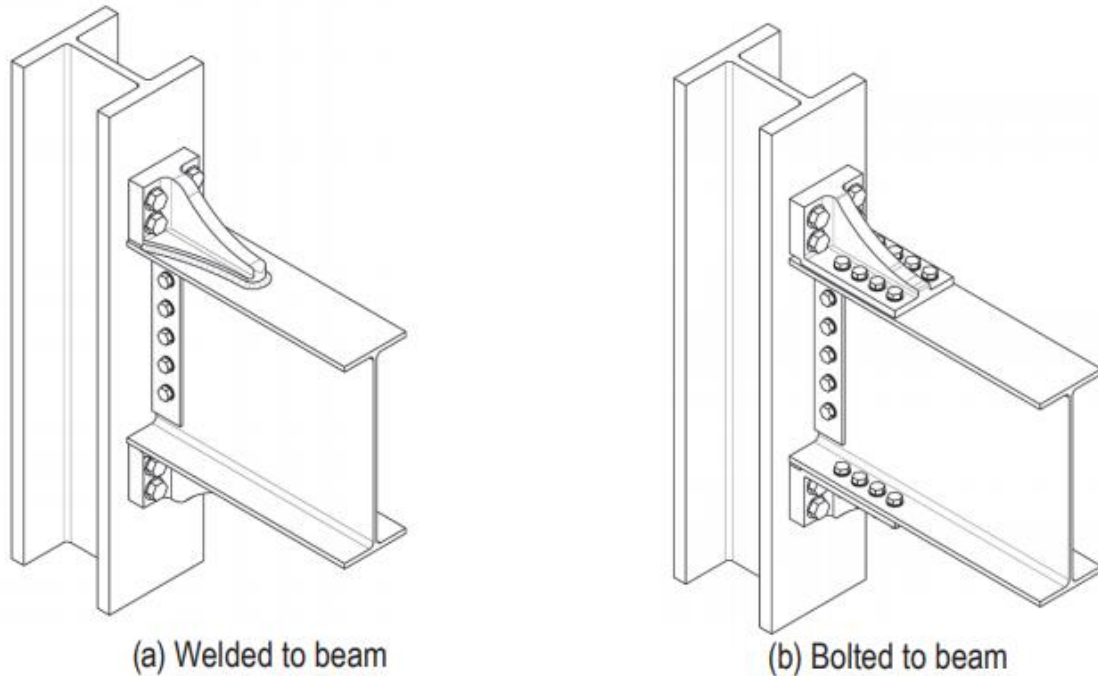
Kaiser bolted bracket moment connection (NIST, 2016).
